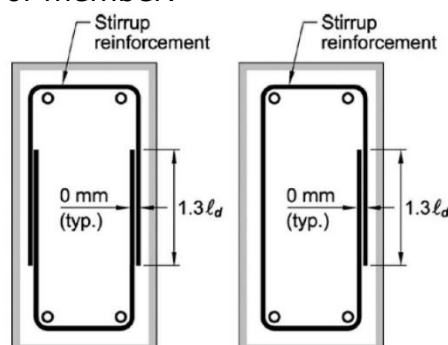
Beam subjected to torsion where closed stirrups should be adopted.
